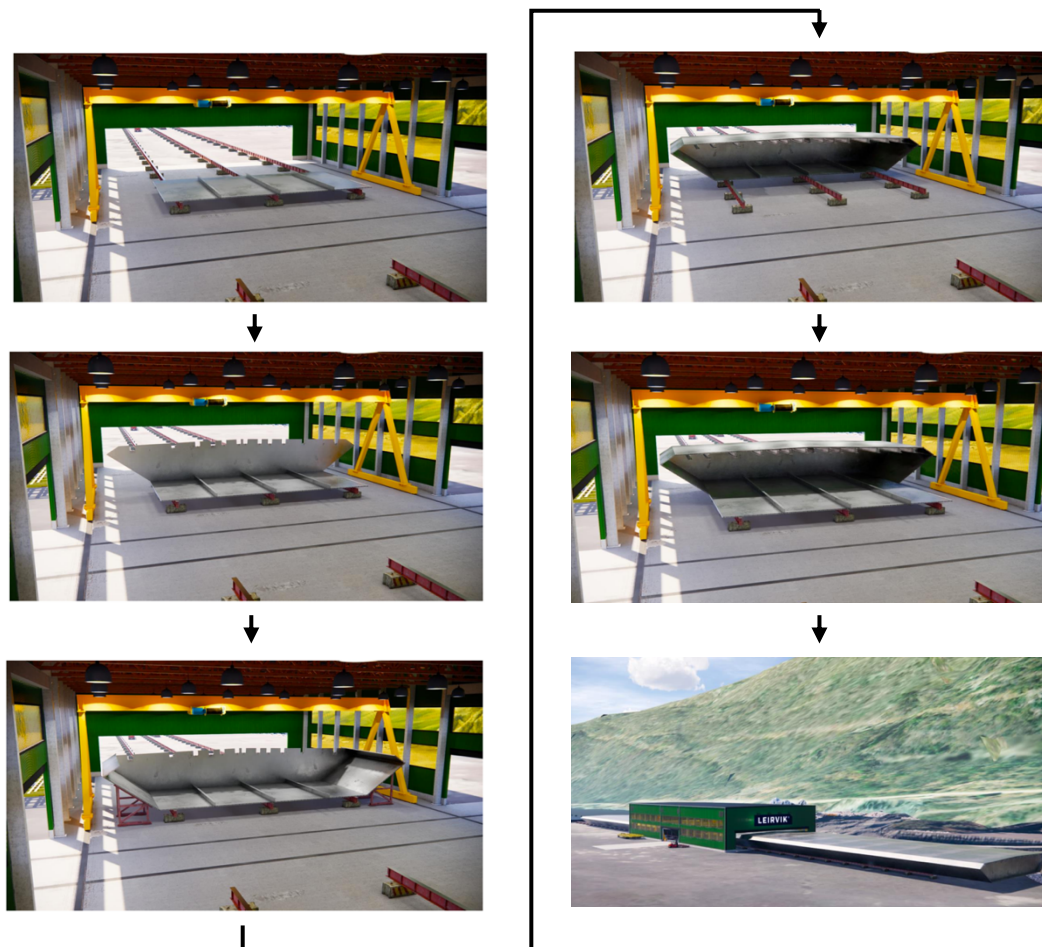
Overview of the assembly steps of the panel concept bridge girder (Olav Olsen, 2019).
